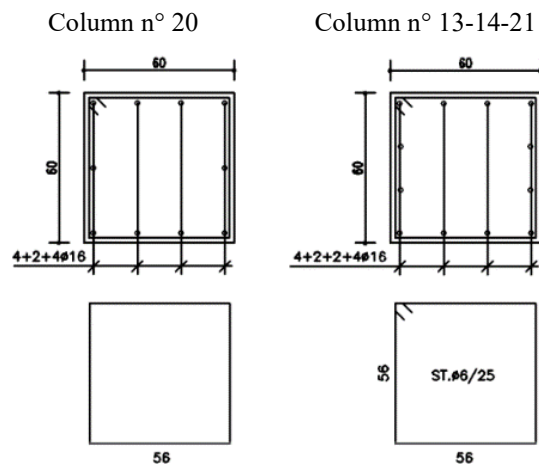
Reinforcements detailing on columns of the 1st and 2nd floors
